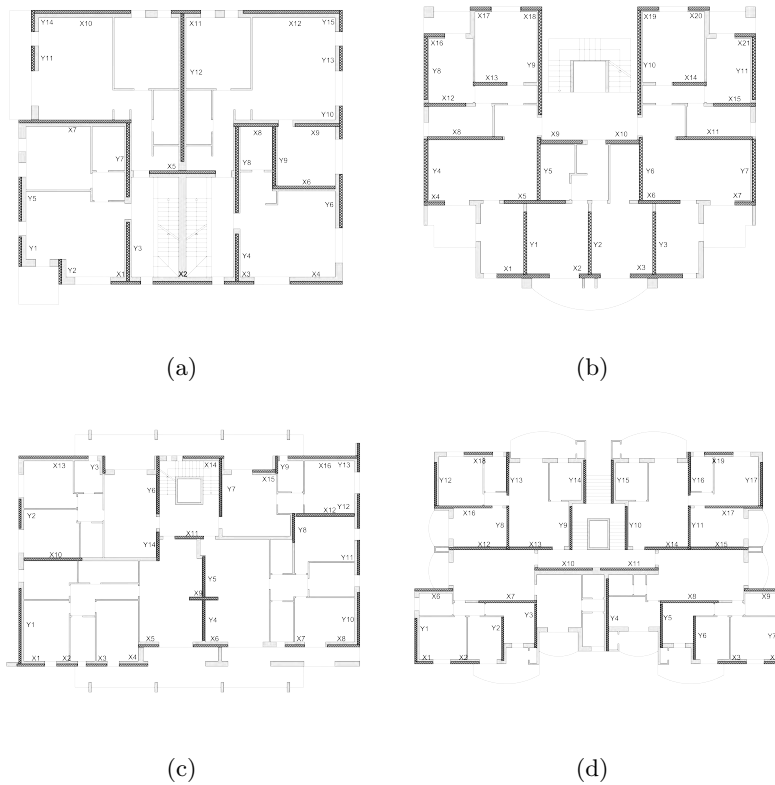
Plans analysed: (a) Building 1, (b) Building 4, (c) Building 2, (d) Building 3.
